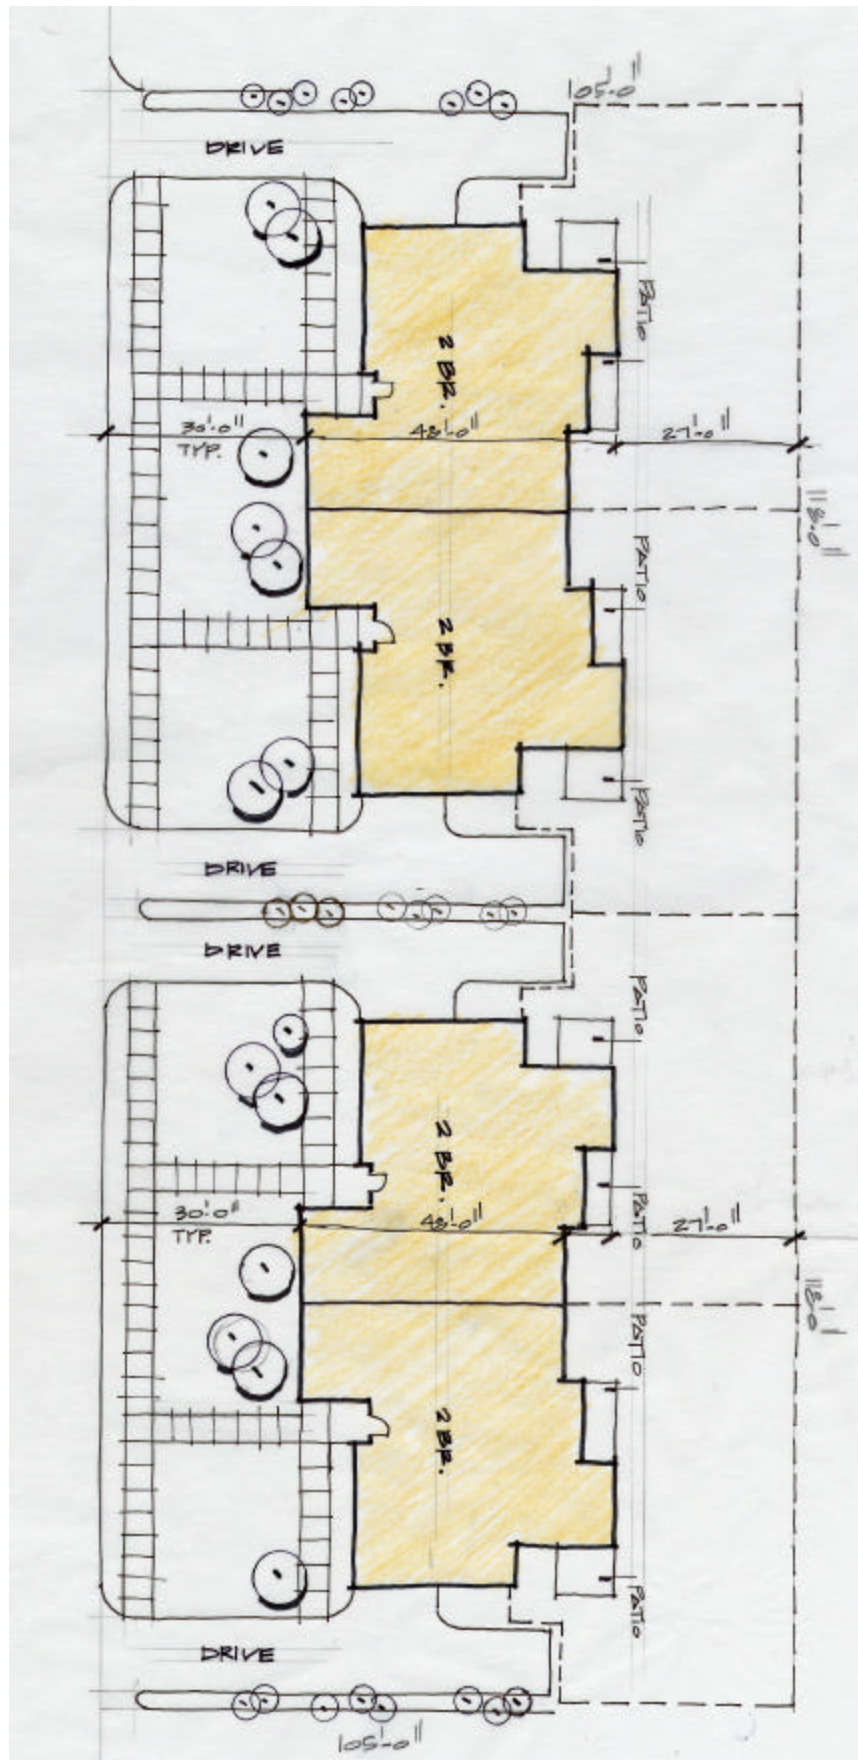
2 BR Duplex Unit – Typical Site Plan
